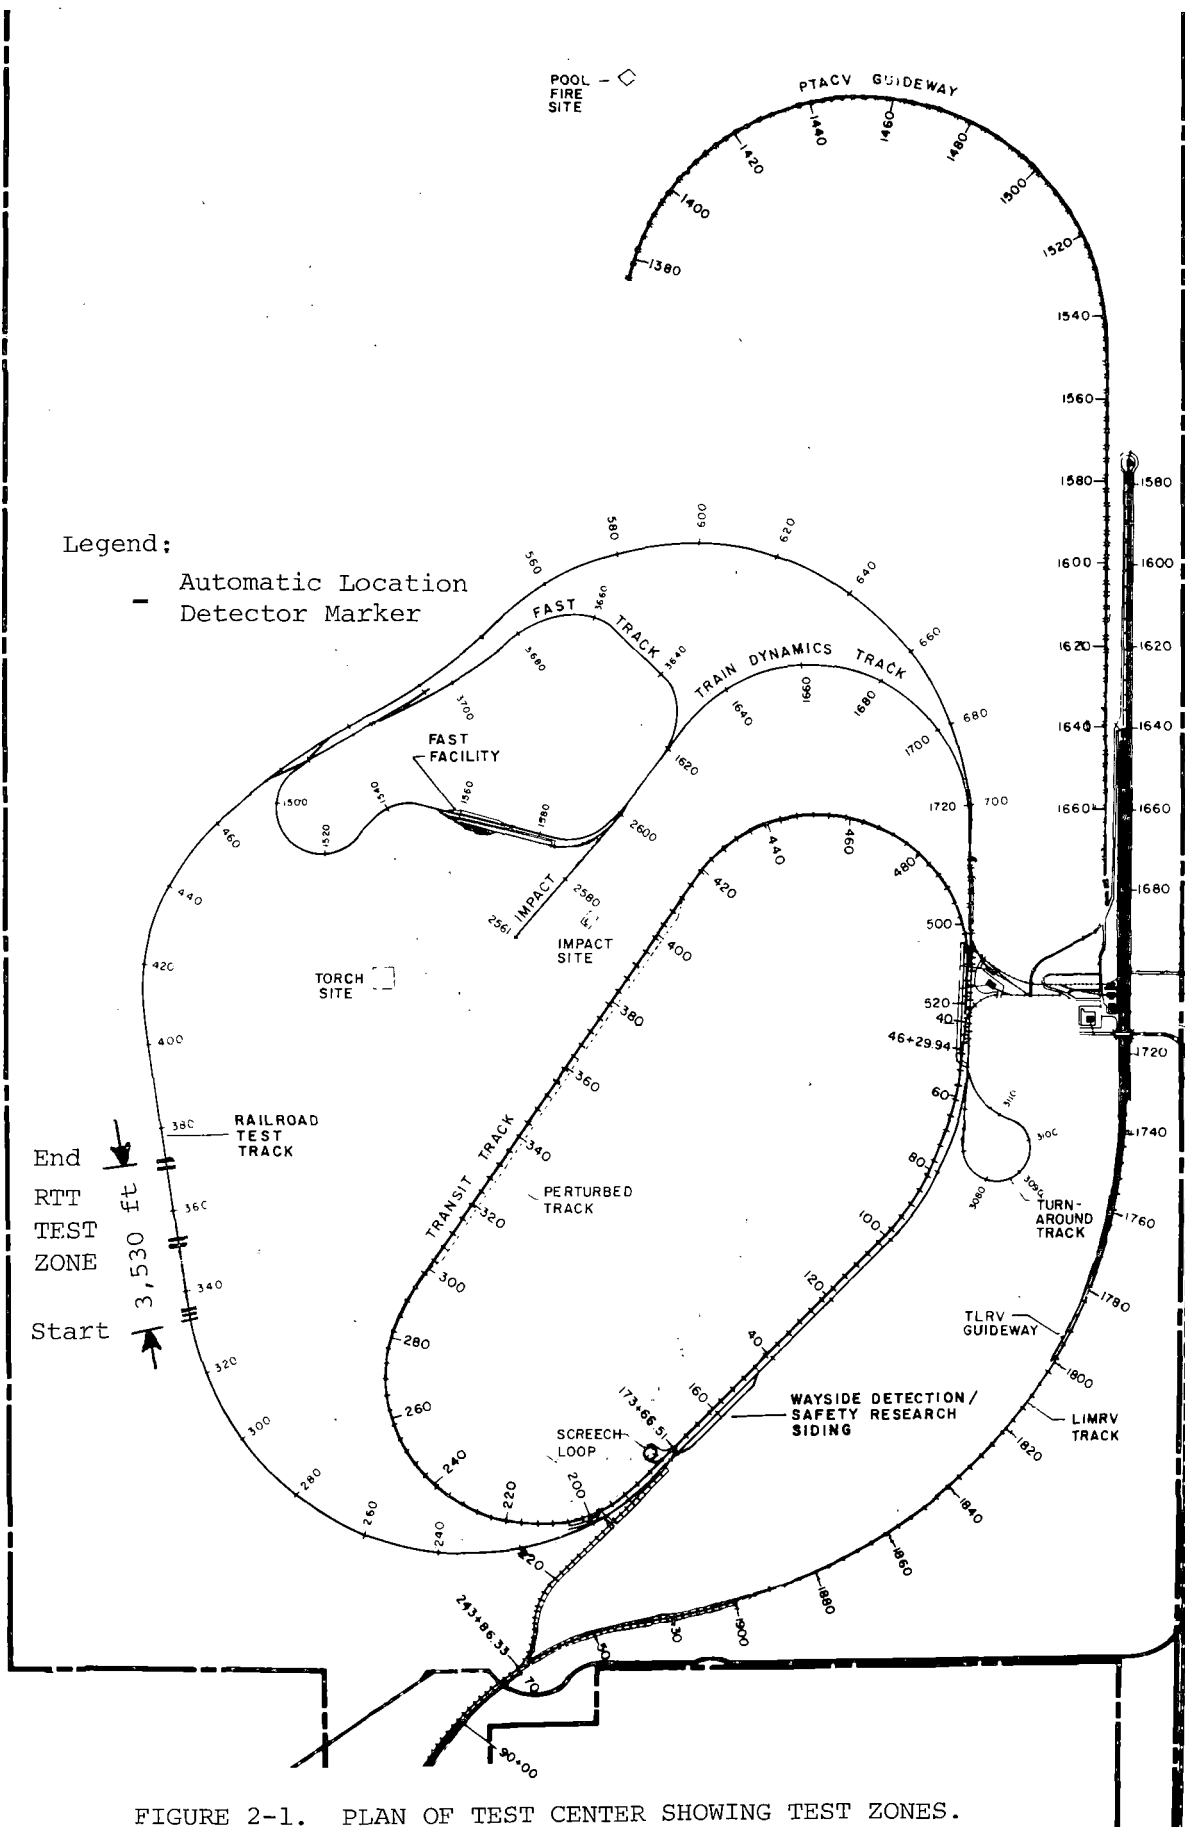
PLAN OF TEST CENTER SHOWING TEST ZONES.
